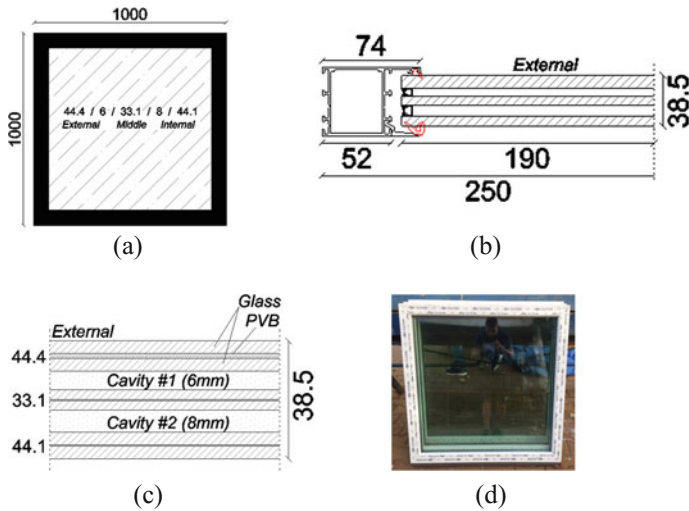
Nominal geometry of the tested TGU samples (dimensions in mm): (a) front view, (b) cross-section (detail, with schematic section of the frame); (c) LG sandwich detail and (d) view of an assembled window
